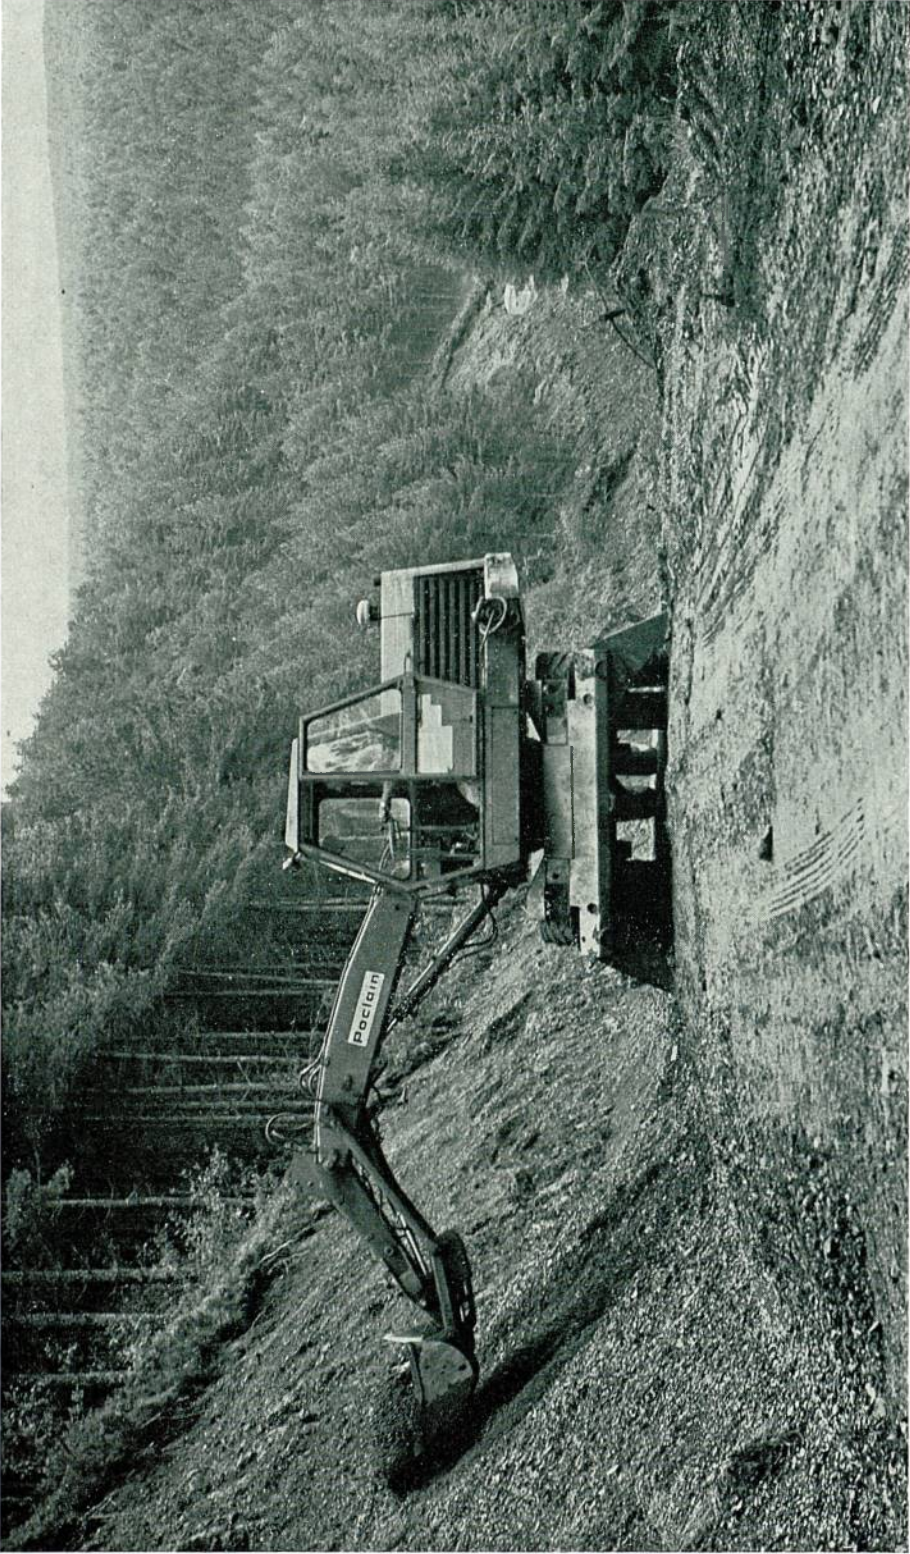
A Poclain excavator engaged on road construction in North Scotland.
